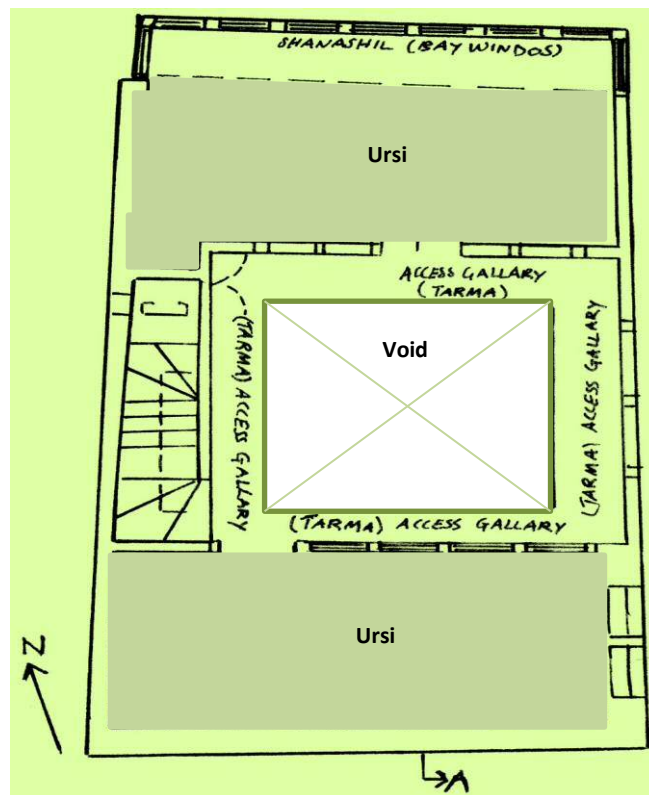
First floor level plan of traditional courtyard house No. 3. Scale: 1:50
